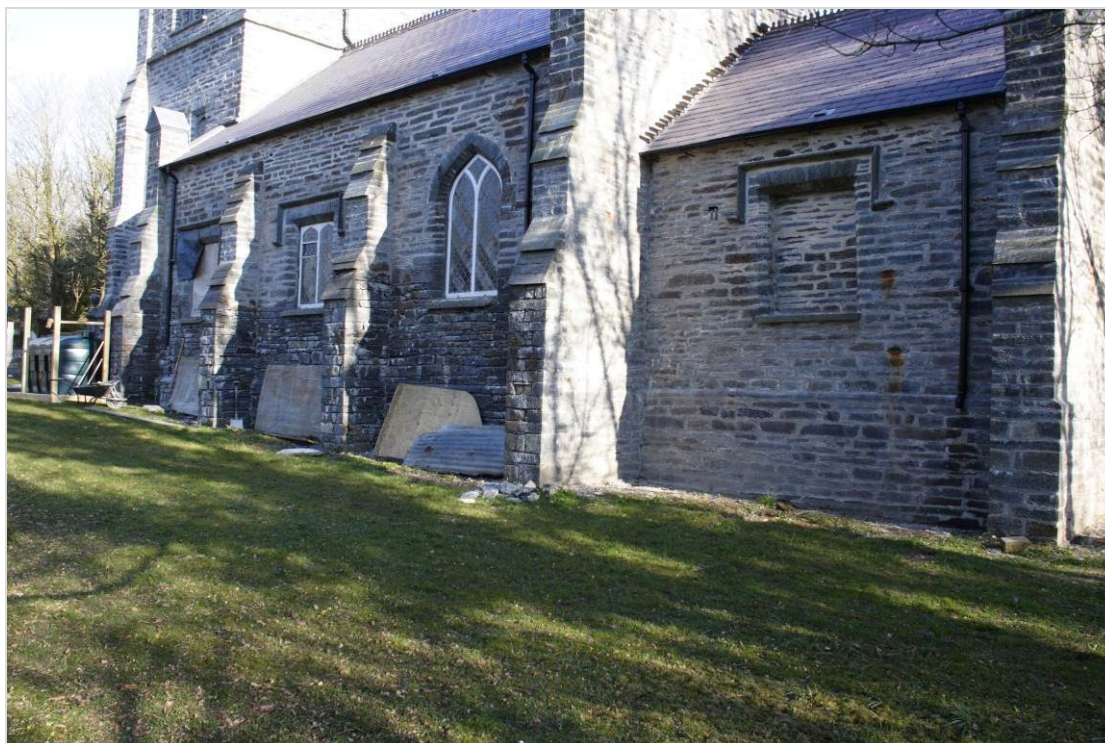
A view of the south facing side of the church before the excavation of the trench for Drain 2
